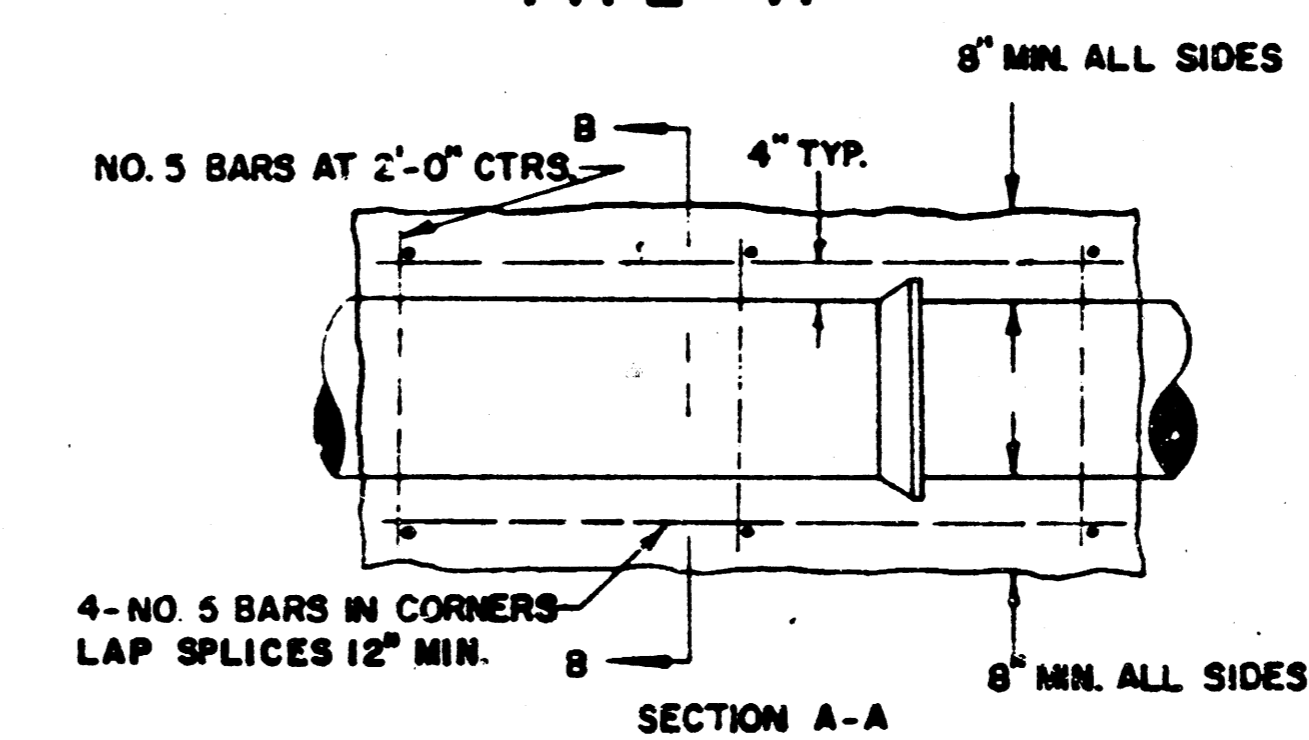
DETAIL OF DROP STACK FOR EXISTING MANHOLES IN GROUND WATER
